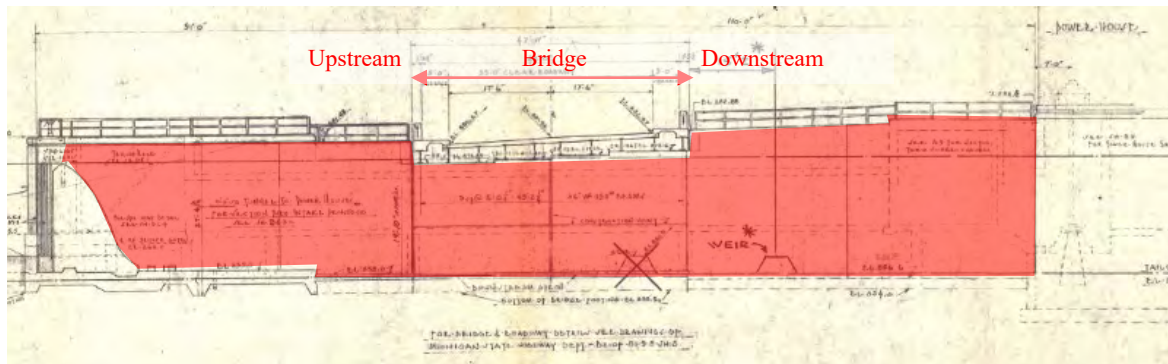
Downstream Left Wall - Elevation Looking Left
